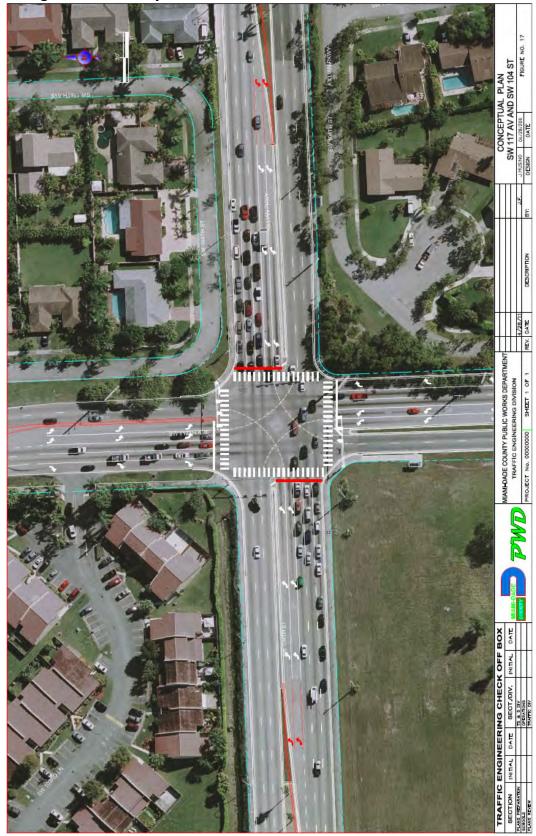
Conceptual Plan – SW 117 Avenue and SW 104 Street
